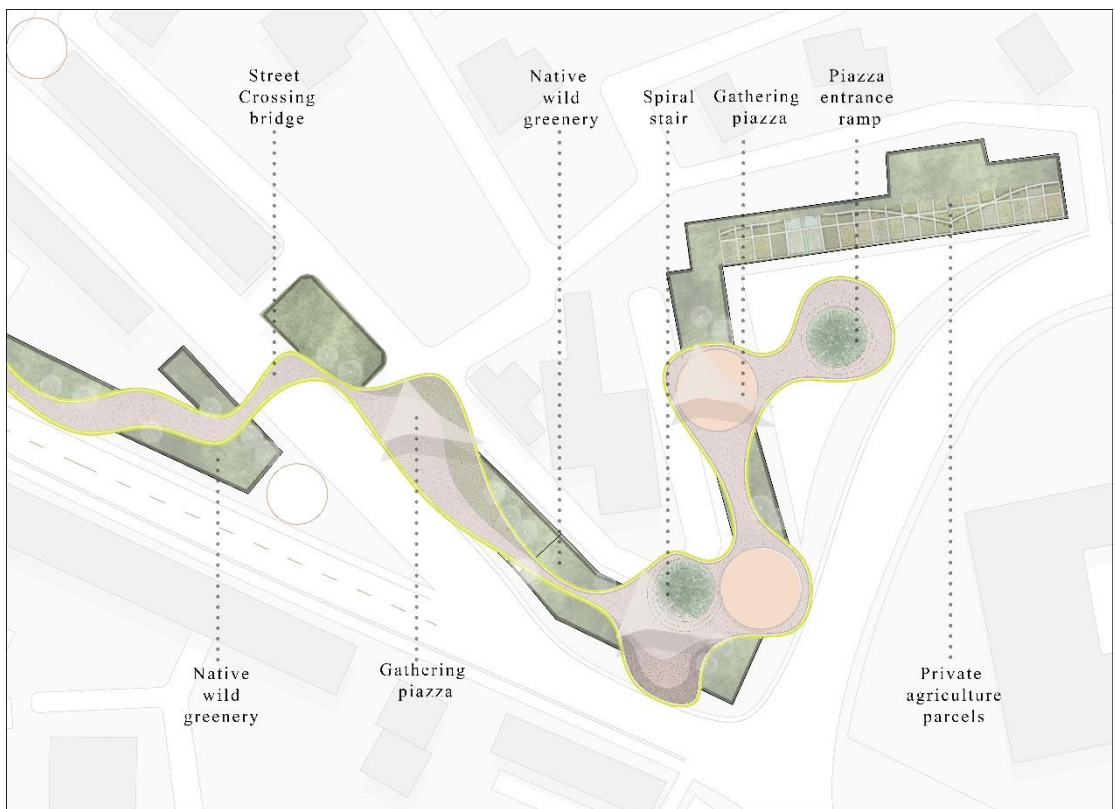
Plan detailing of the elevated roof, part 1 (by author)
